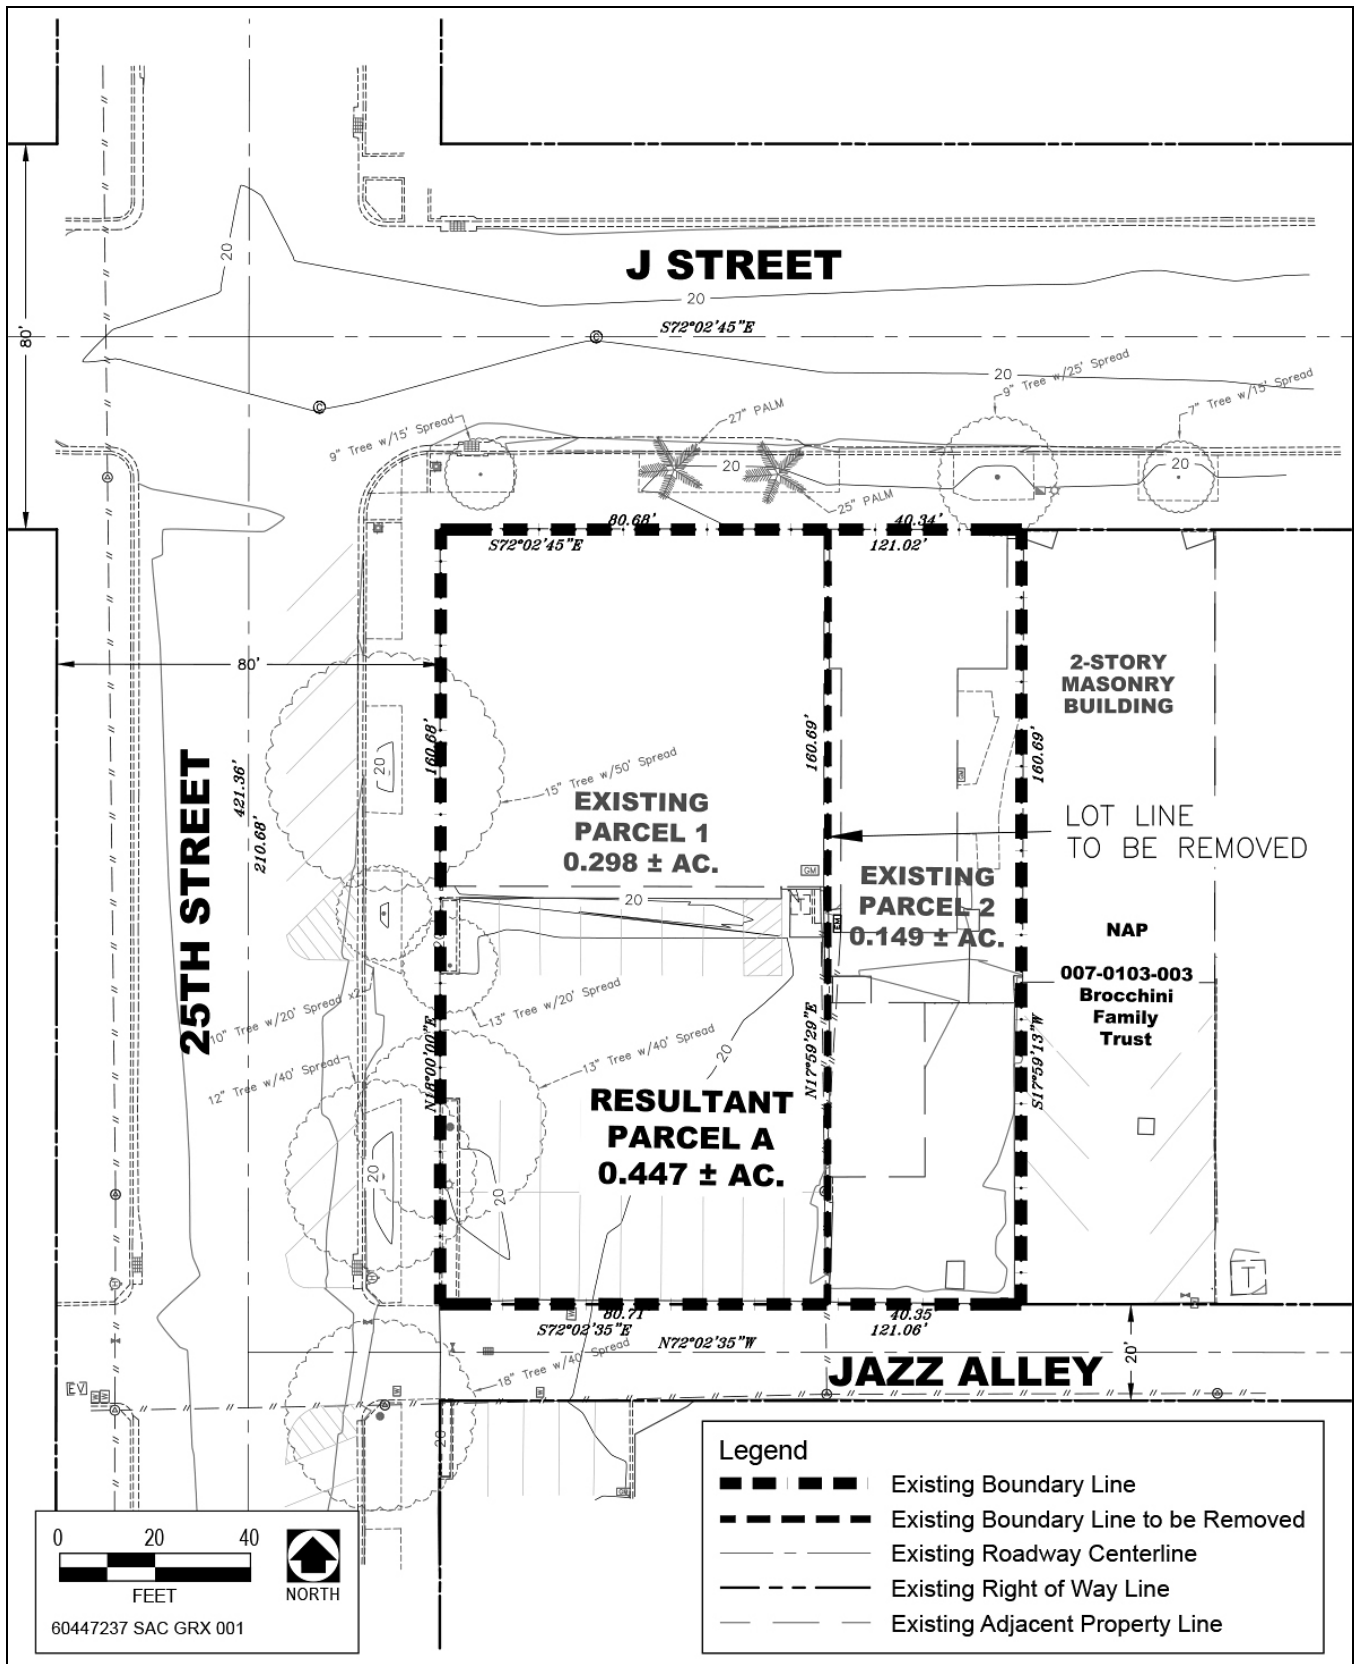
shows the project’s proposed tentative map. Exhibit 2-3 shows the proposed building elevation, as viewed from J Street. Exhibit 2-4 shows the proposed building elevation, as viewed from 25th Street. Exhibit 2-5 shows the proposed building elevation, as viewed from Jazz Alley. Exhibits 2-6 through 2-15 show the floor plans.
